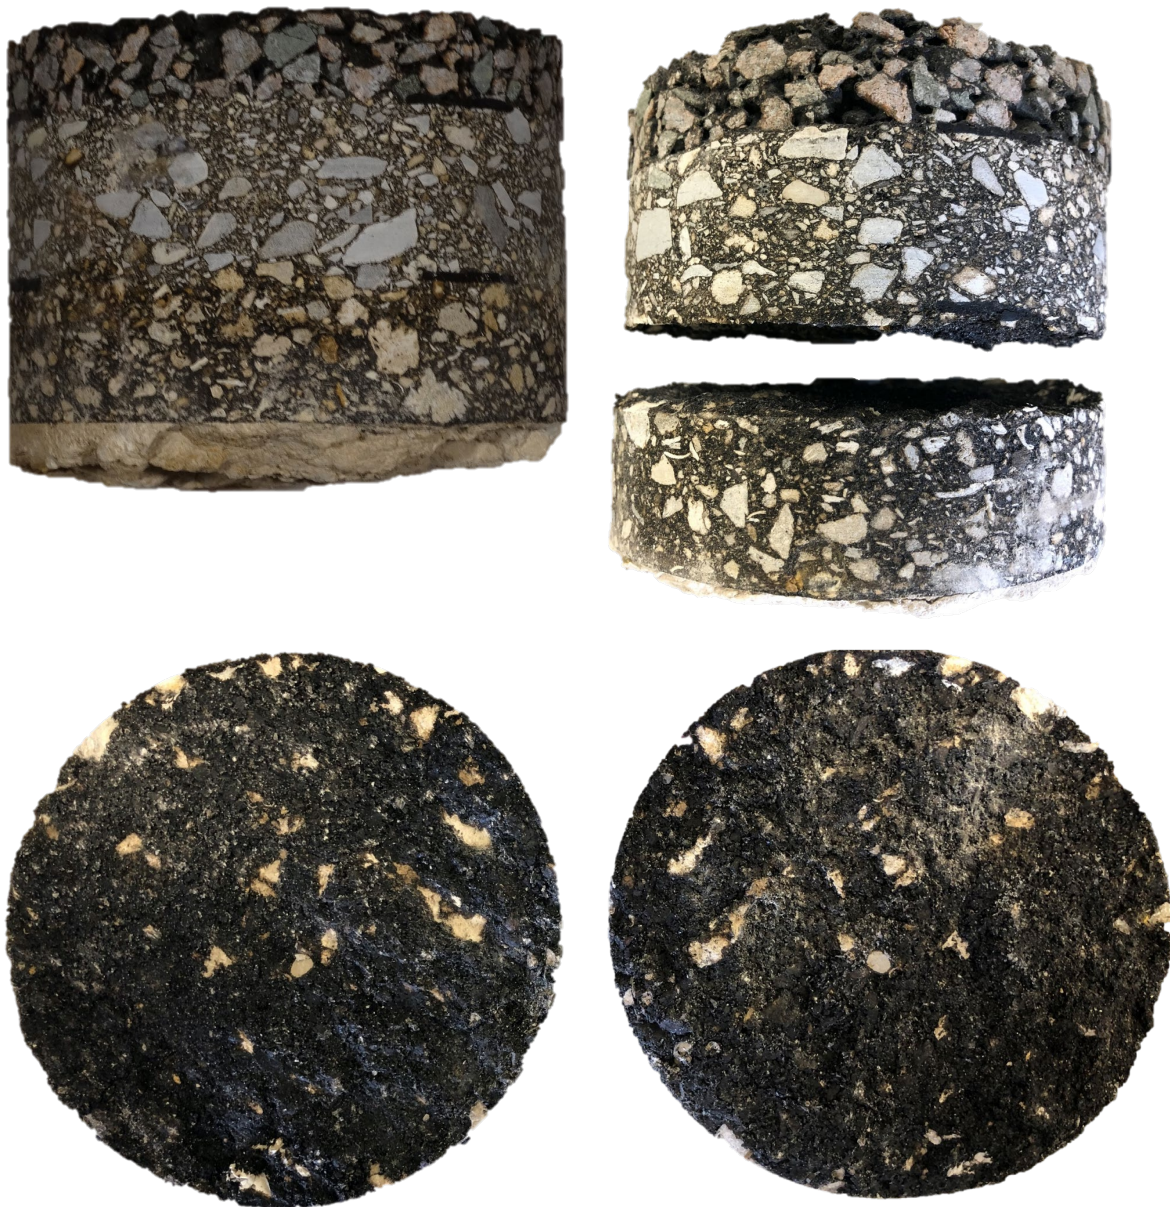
US 17 Worm Section MP 31.130 Bond Test Failure Outside of Interface
